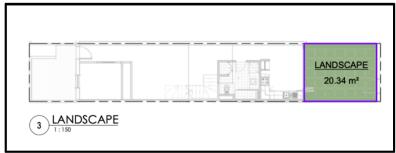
Proposed Landscaped Area (Source: 3 Lines Architectural Designs, 2020).
